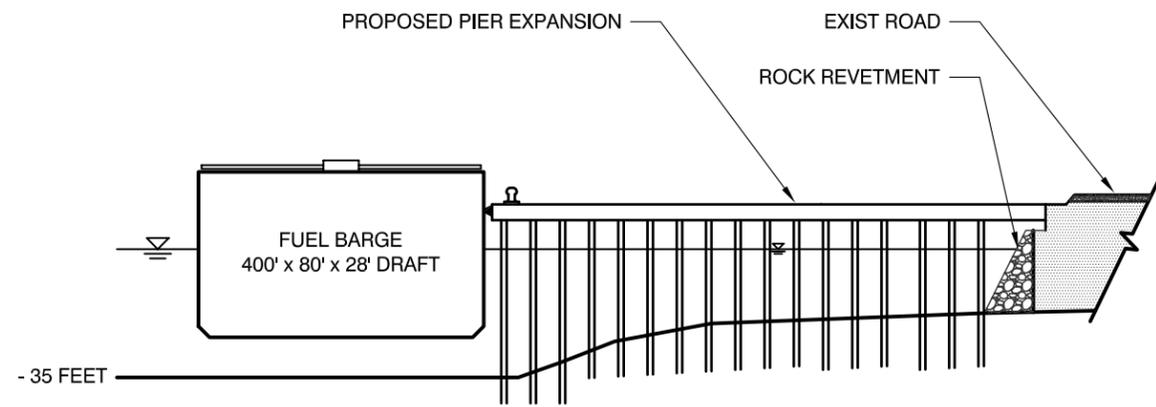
CONCEPTUAL DESIGN - ALTERNATIVE D - DETAIL SECTIONS
